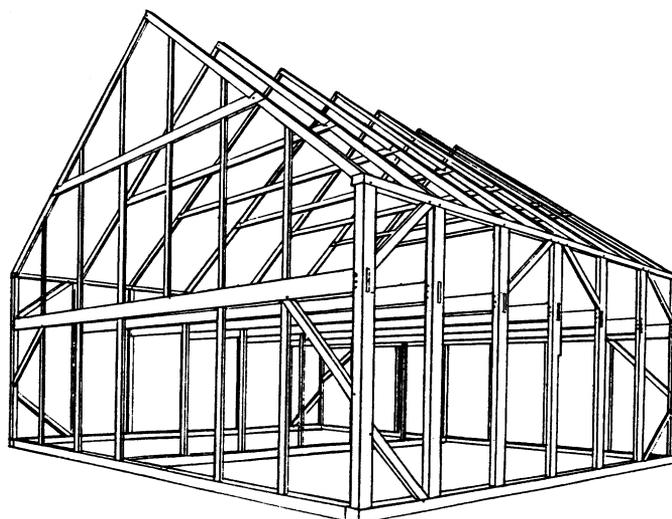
Dutch American anchor-bent framing: seven anchor bents 4 feet on center, with one front room and two rear rooms. Hand house, Dutch Neck, Mercer Co., N.J., ca. 1740; demolished 1978. (Drawing, C. W. Zink.)
